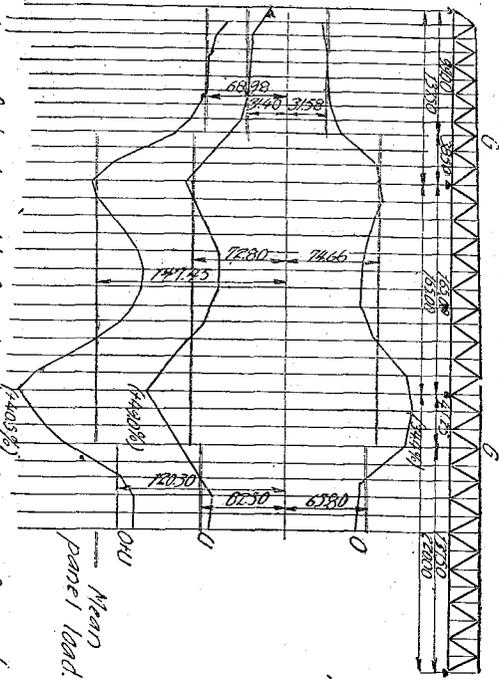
Distribution of dead weight of girder type girder on 5 Support. Executive design of bridge over Meinen Belt.
